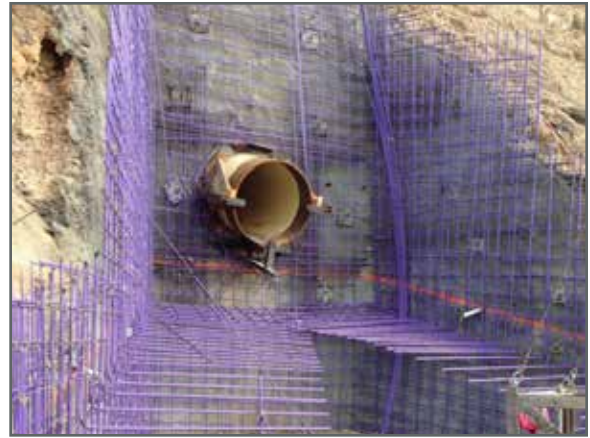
Outlet structure under construction with soil nail shoring system visible.
